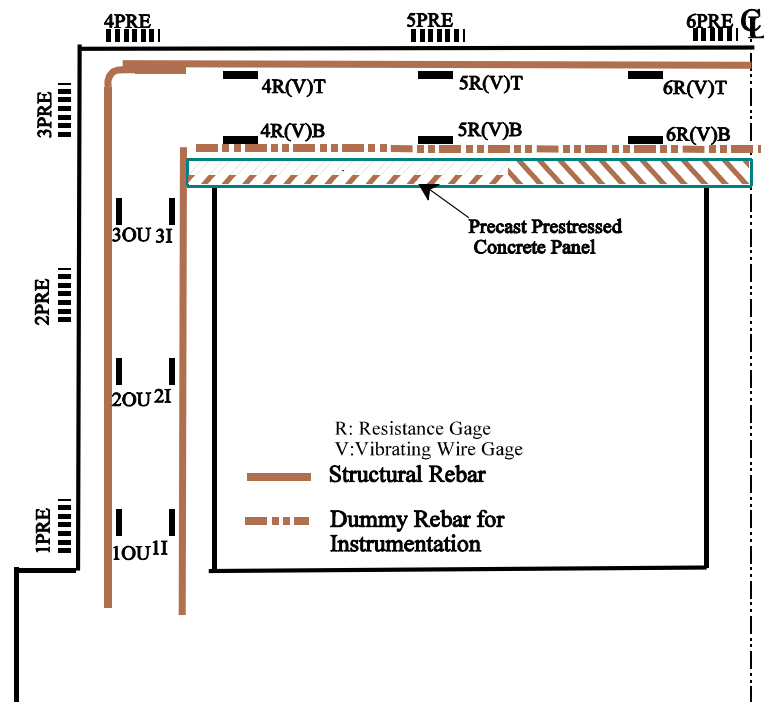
Detailed Illustration of Greene Co. Culvert Instrumentation for Static Cells
